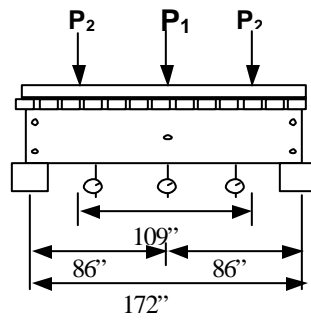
3-Span Bridge Chord with 1- and 2-Point Loading Configurations
